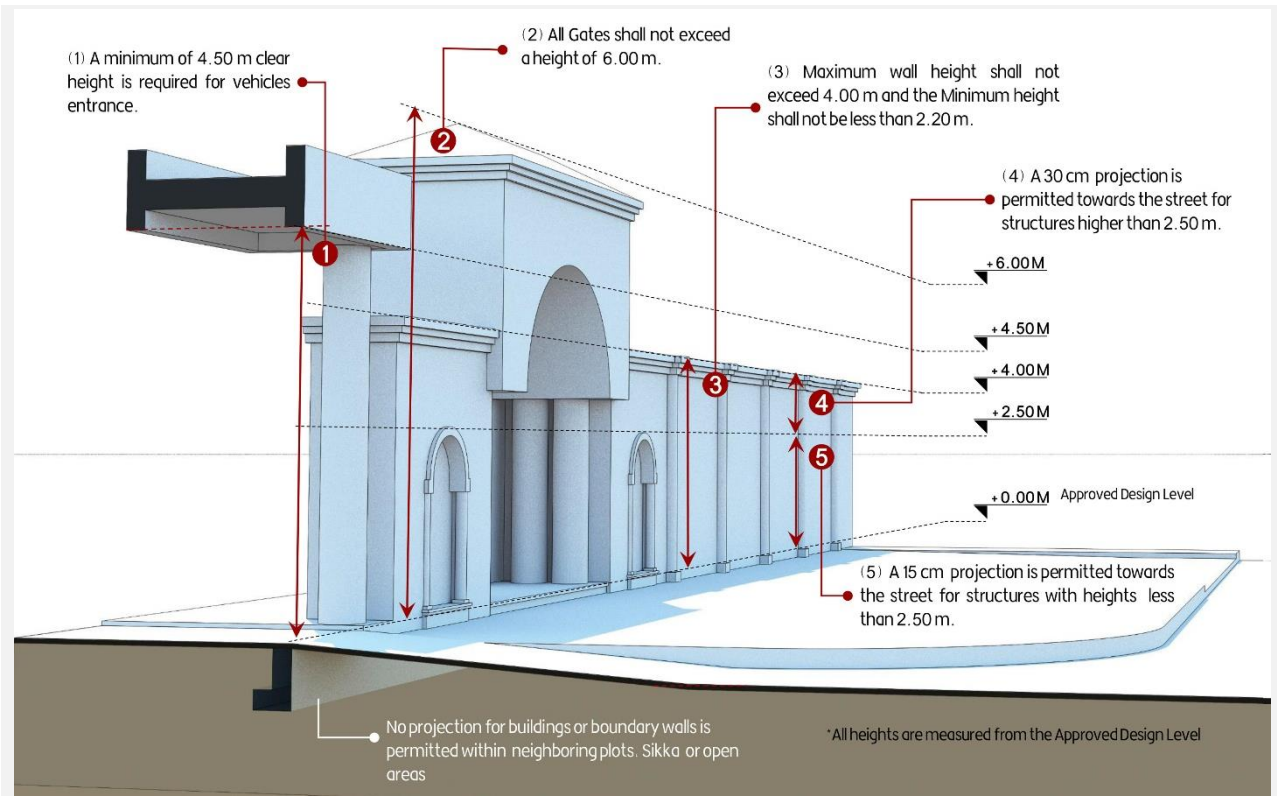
Residential Villa Wall (Boundary Wall) Requirements
